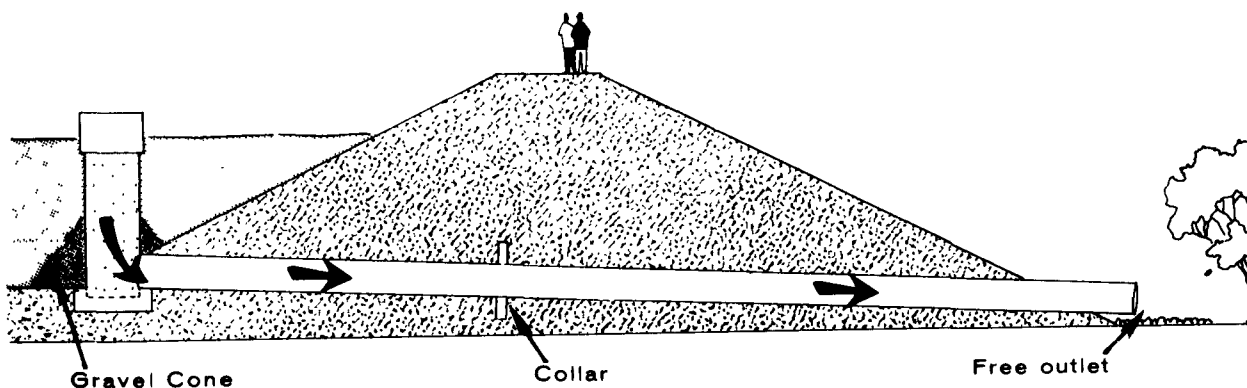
Large, Well-Engineered Sediment Basin Dam. Note Principal Spillway Pipe with Riser, Gravel Core Filter, and Seepage-path Cut-off Collars on Outlet (Reference No. 17).
